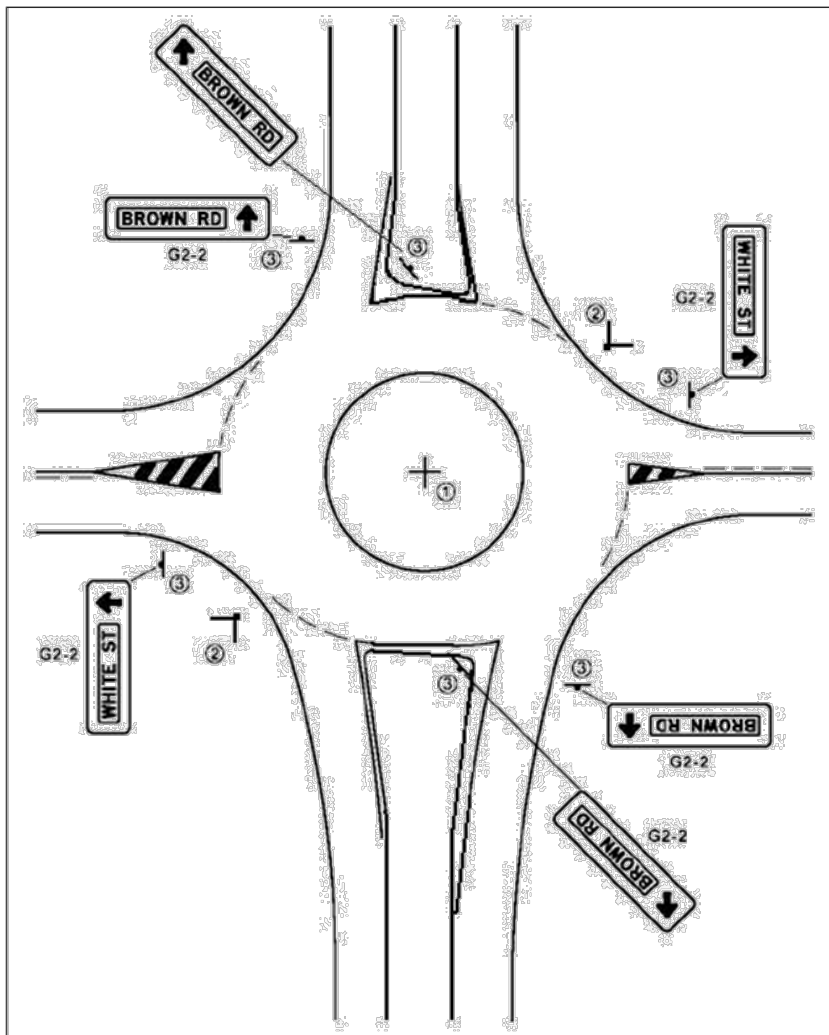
PROVISION OF ADDITIONAL STREET NAME SIGNS AT A ROUNDABOUT
